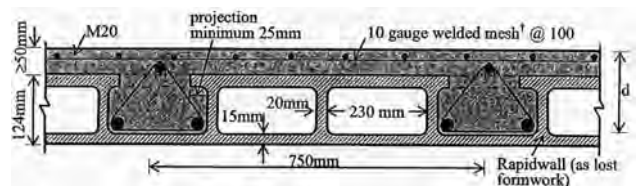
Typical cross-section of RW-RC floor slab – Rapidwall with embedded micro beams
